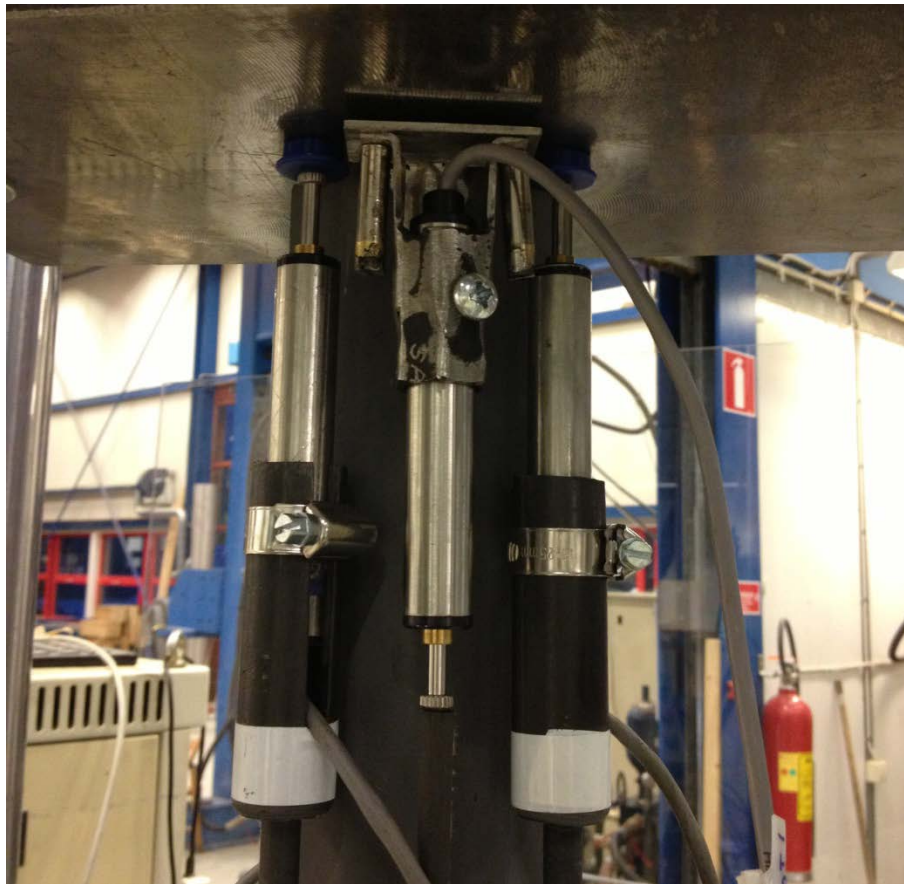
Mounting of LVDT1 to welded plate in upper part.
